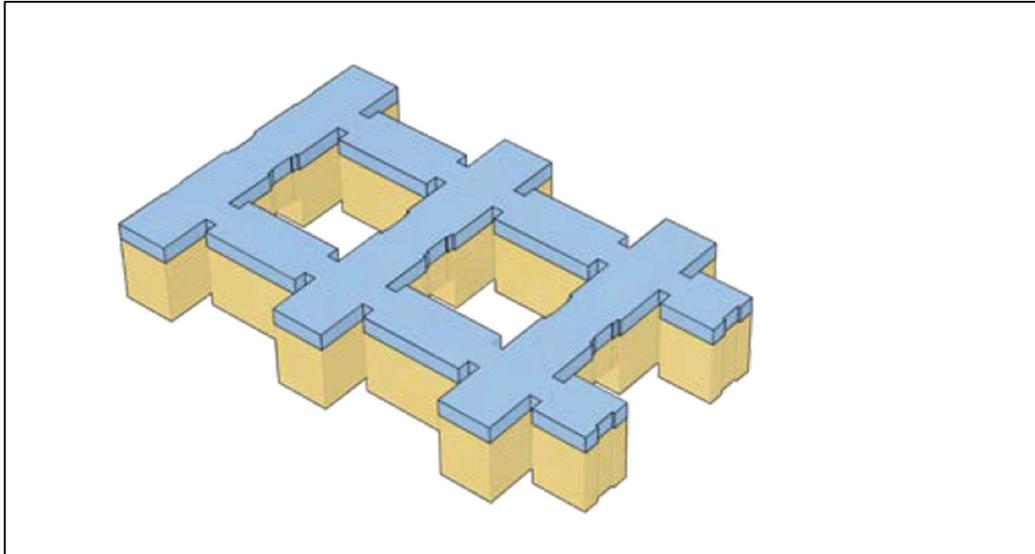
Stage No. 3 of the Proposed Design. Introduction of a new 4th Floor
